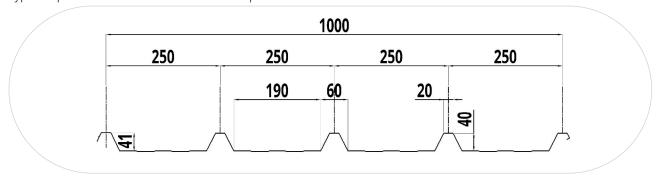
Geometry of roof panel with Z-Lock system (PRT Z)
